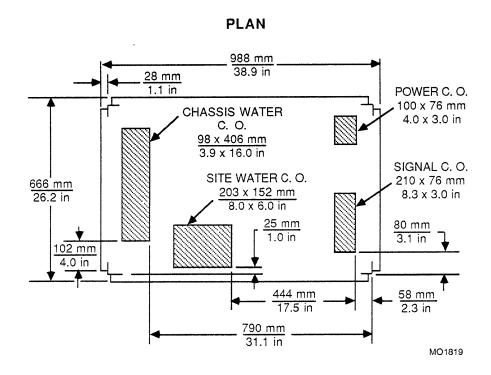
18677-1 Water Cooling Unit Floor Cutouts
